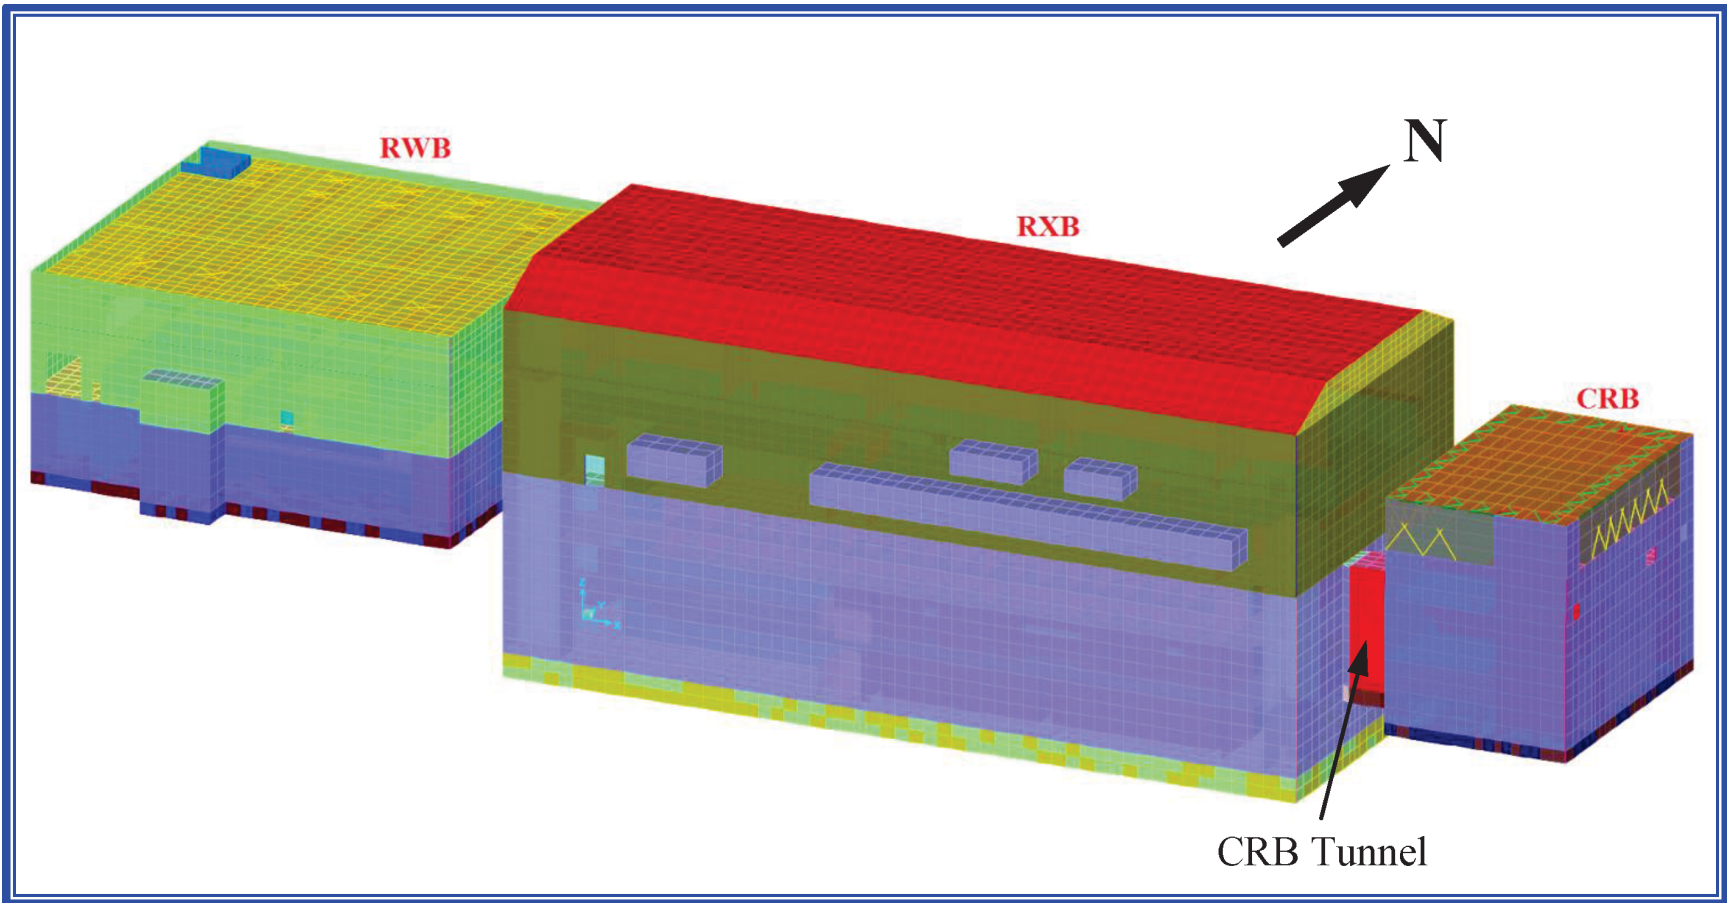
Isometric View of North Side of Triple Building SAP2000 Model (Looking Southwest)
